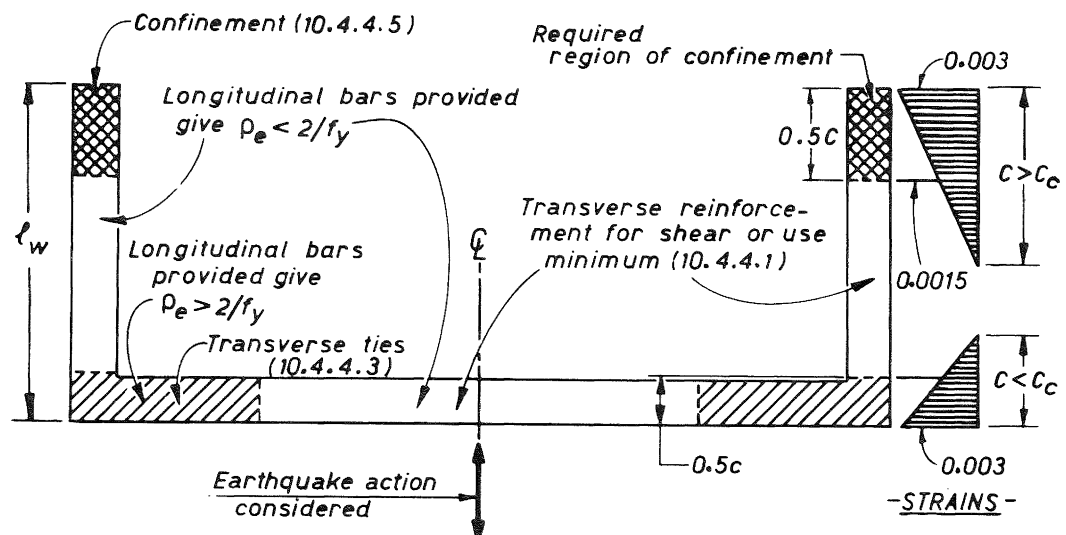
Regions of Different Transverse Reinforcement in a Shear Wall Section.
